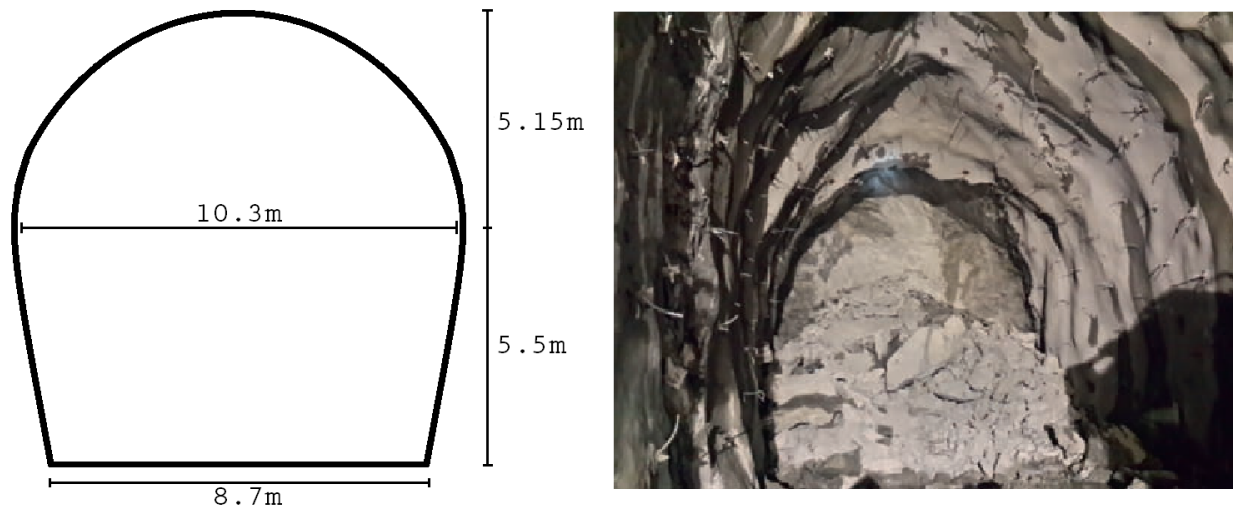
Situation after strain burst occurred in roof of the waterway tunnel of the Cerro del guila Hydro Power Plant (from: Sayah et al. (2016))
